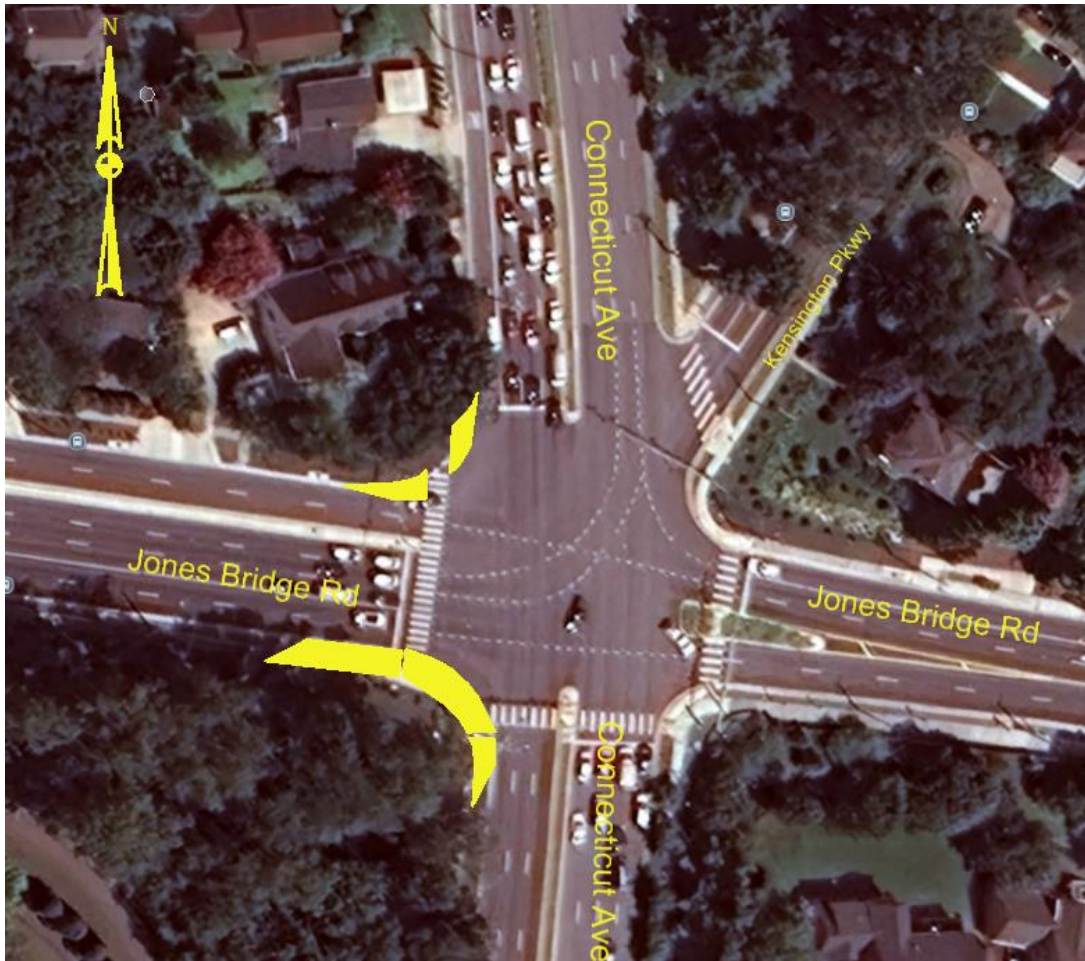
Alternative 3 - Improve Visibility and Pedestrian Accessibility Concept Plan
